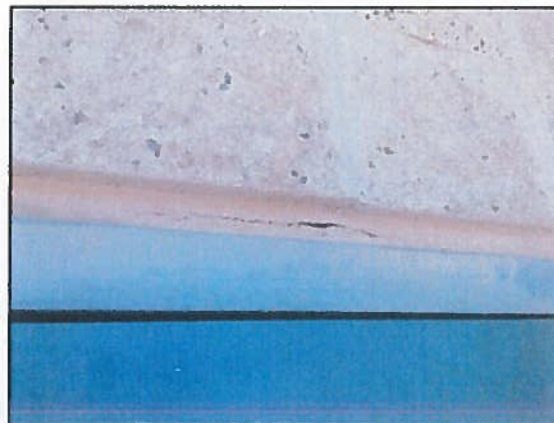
Maintenance Facility – Mild joint seal wear over back exterior door
